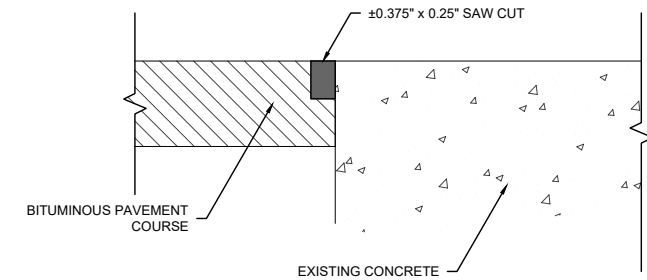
DETAIL B - CONTRACTION JOINT (FIELD Poured)
